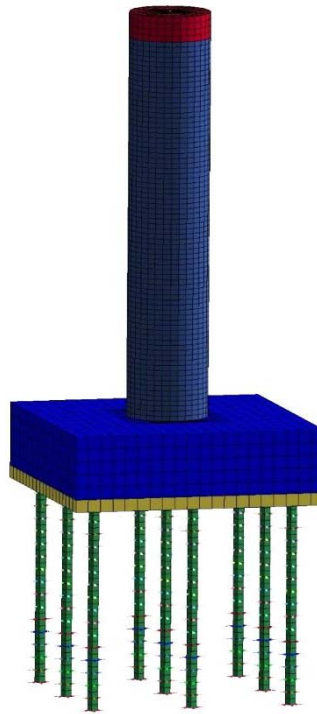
Single circular pier with 8 m long pipe piles and soil springs
